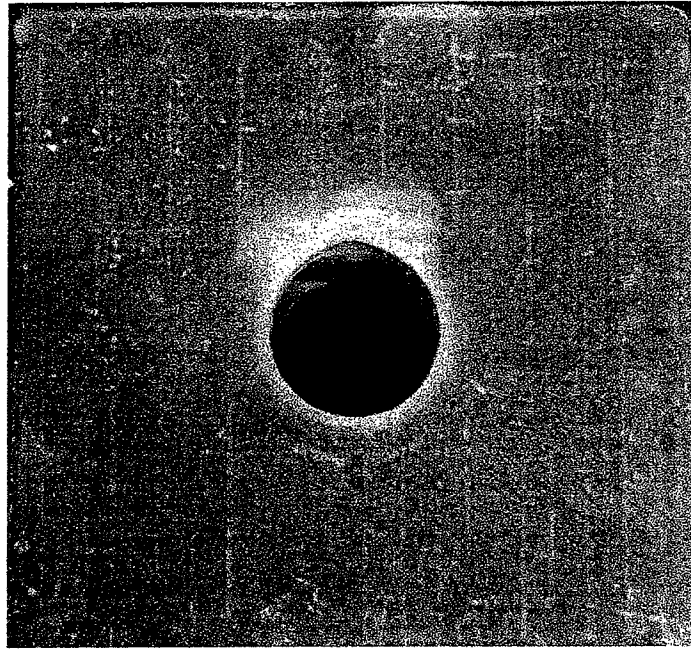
Typical View of Bottom Face Sheet after Loading
